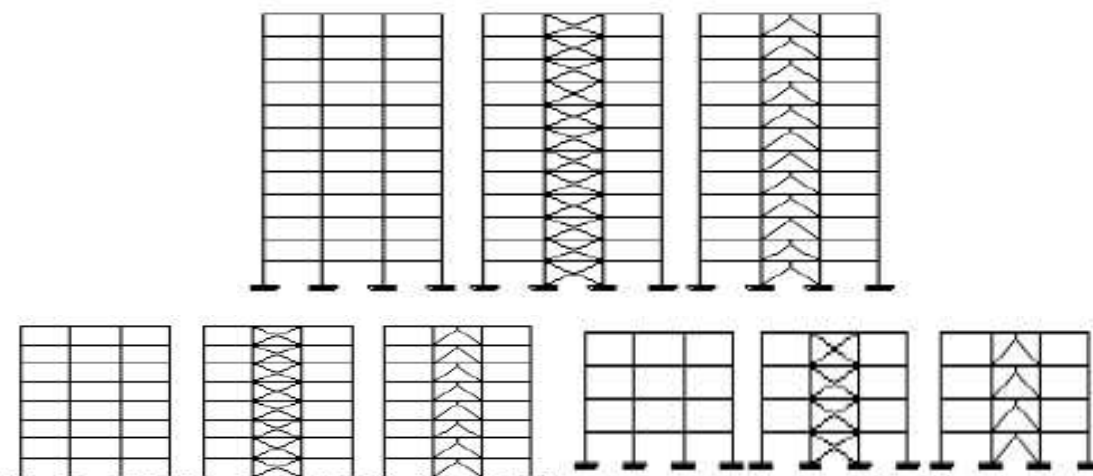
Concrete moment frame alone, Concrete moment frame with X shape brace and Concrete moment frame with inverted Y shape brace figures in three height 4, 8 and 12 stories[1]
